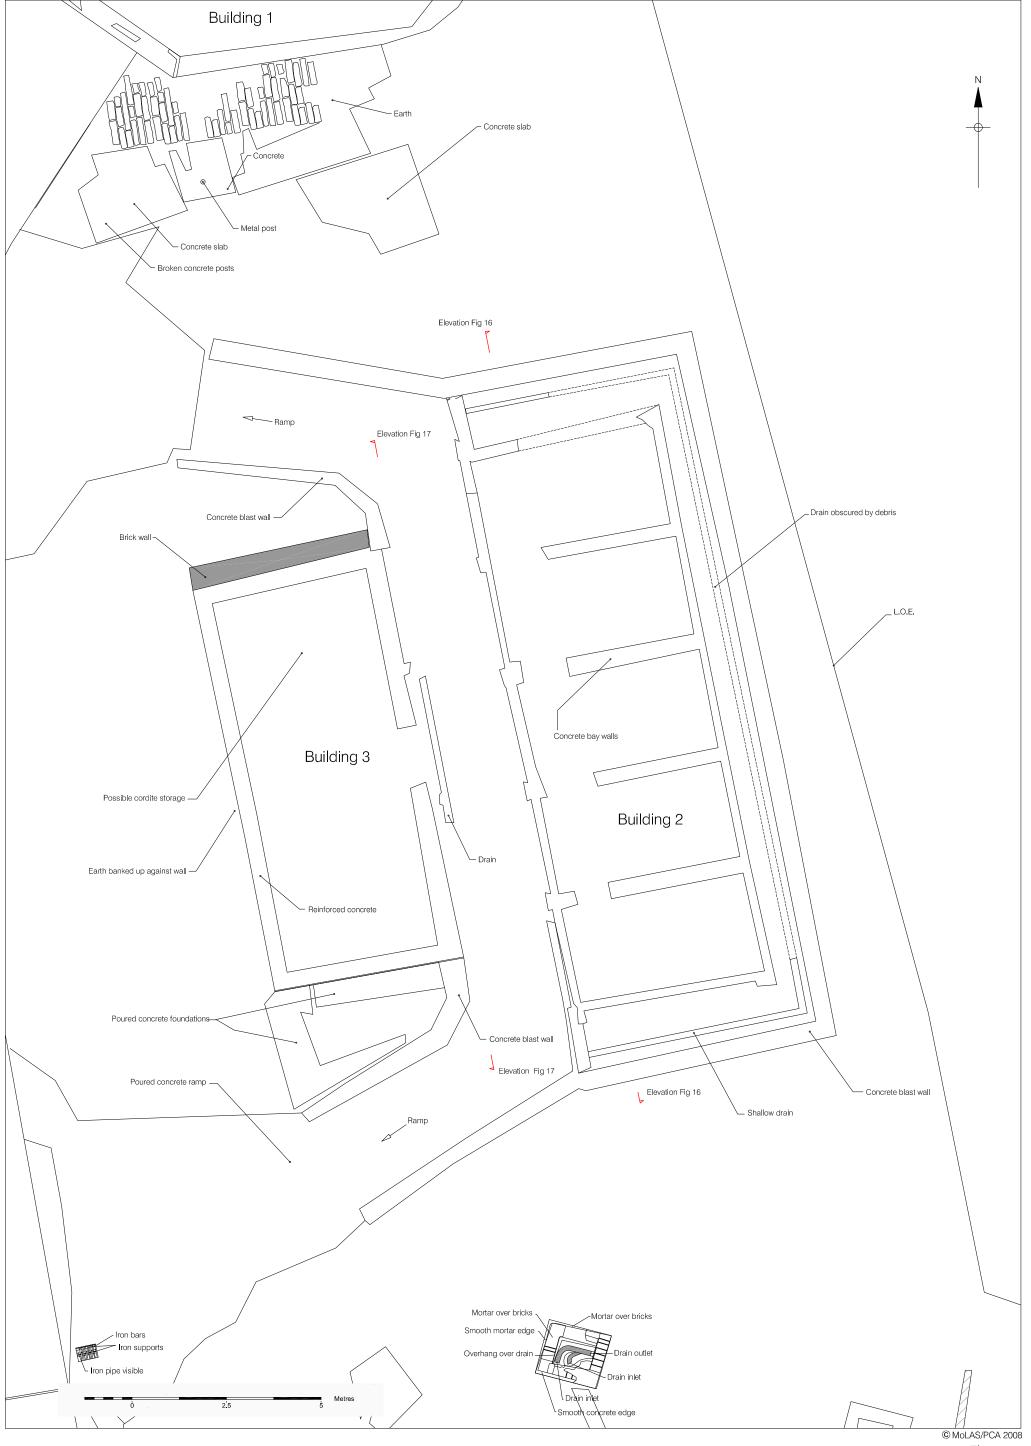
Buildings 2 & 3, cordite store and magazine, plan 1:100 at A3
